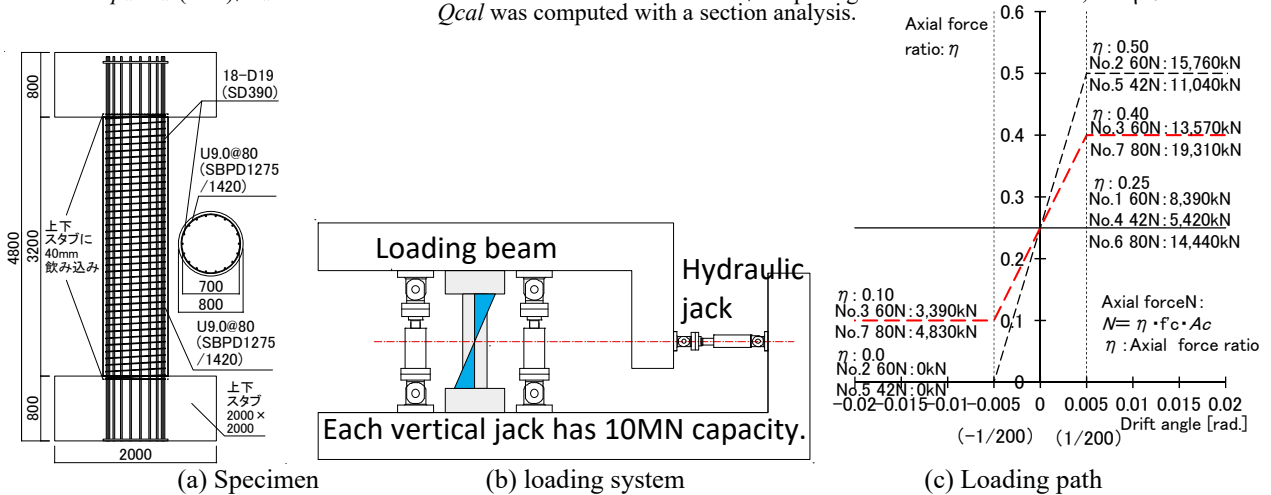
Pile specimen for bending/shear test at Taisei corporation (Unit: mm) [5]
